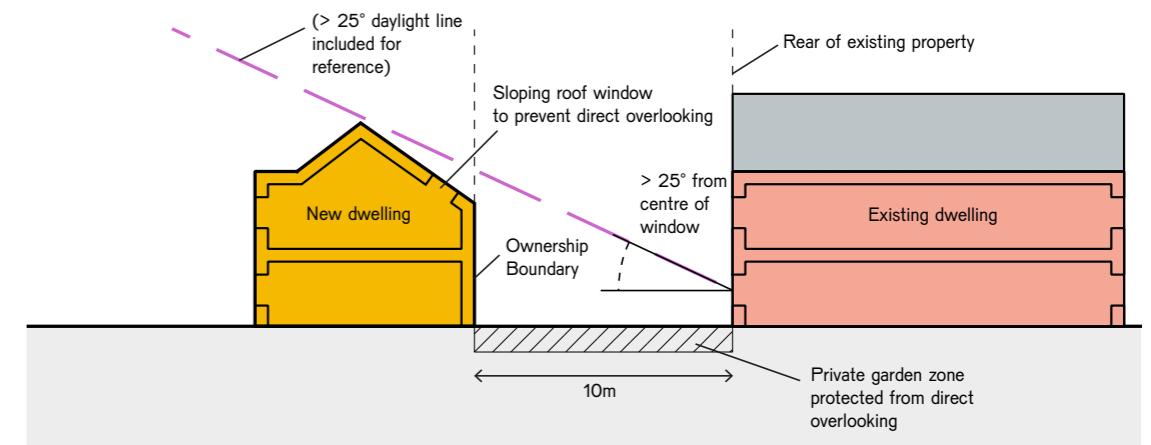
The use of sloping roof windows can help avoid direct overlooking of neighbouring gardens
